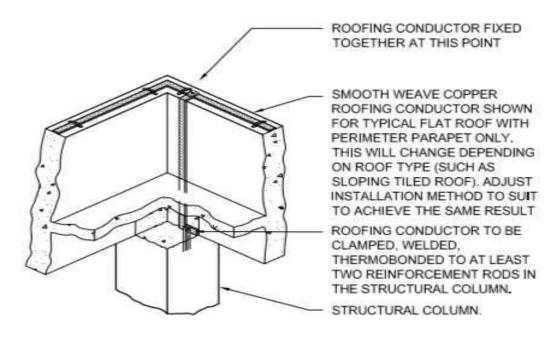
Roof Perimeter Conductor Connection to Structural Column Details
